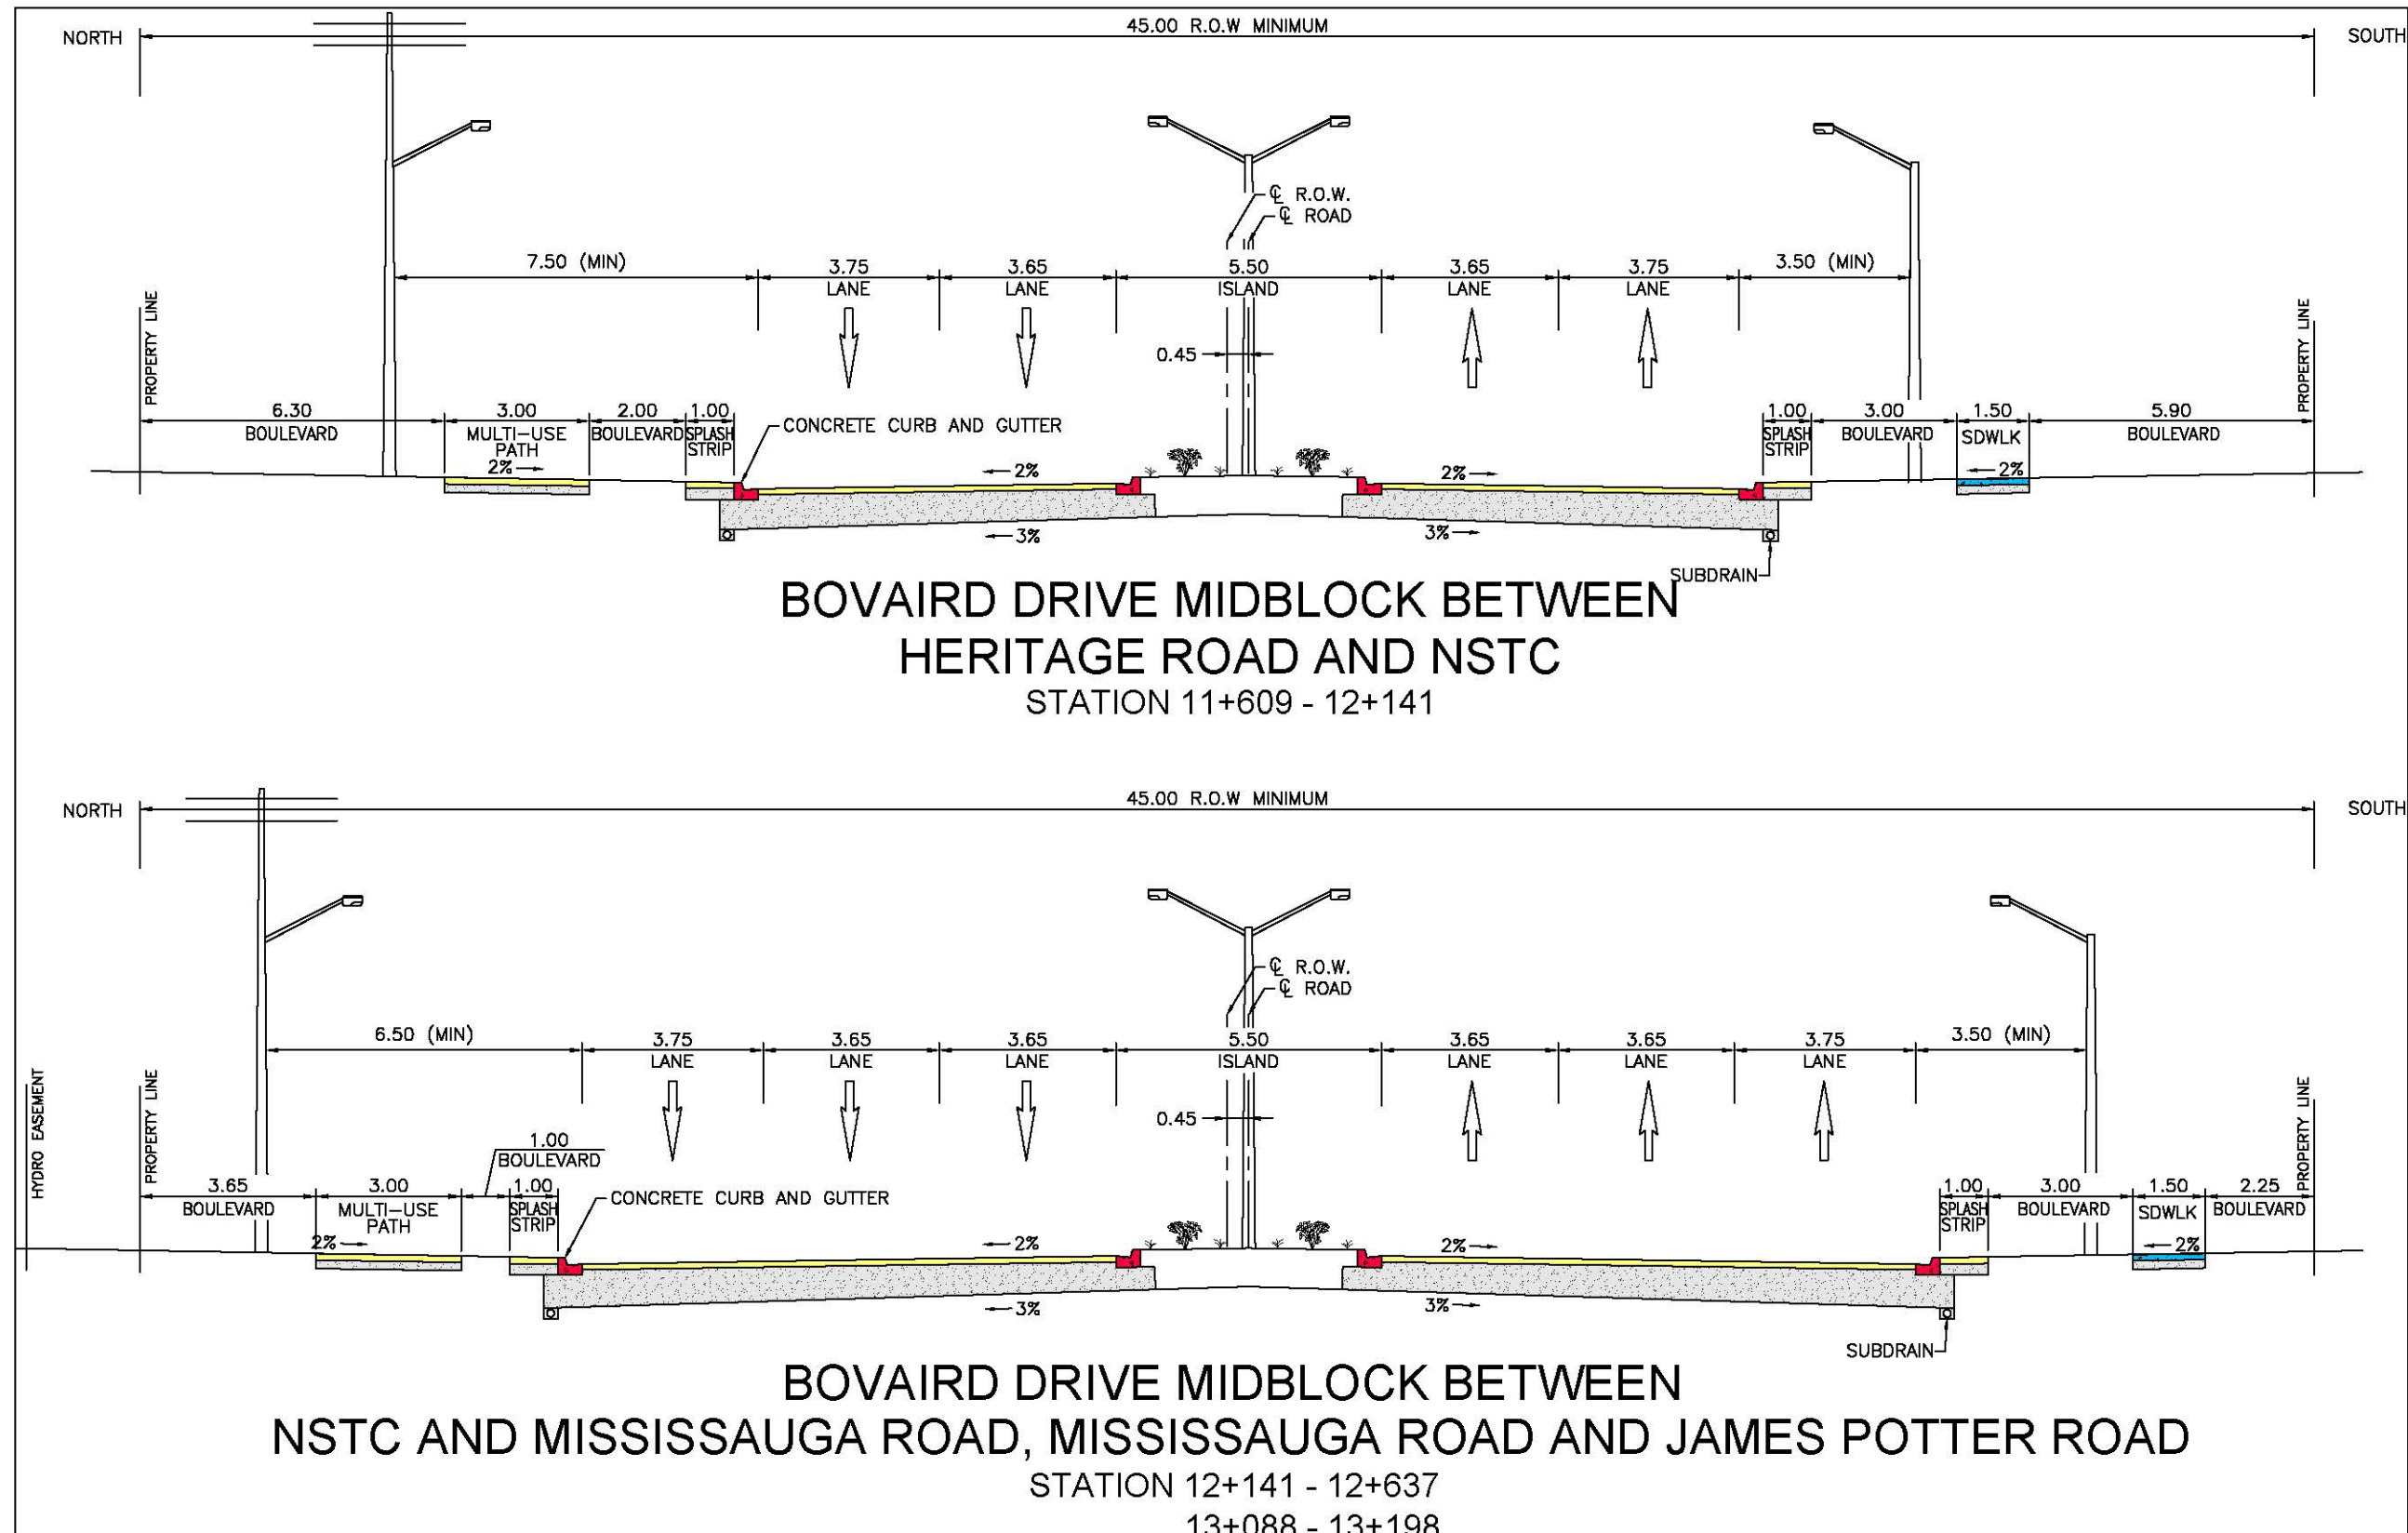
Typical Cross Section – Bovaird at James Potter, Mississauga, Ashby Field Road
